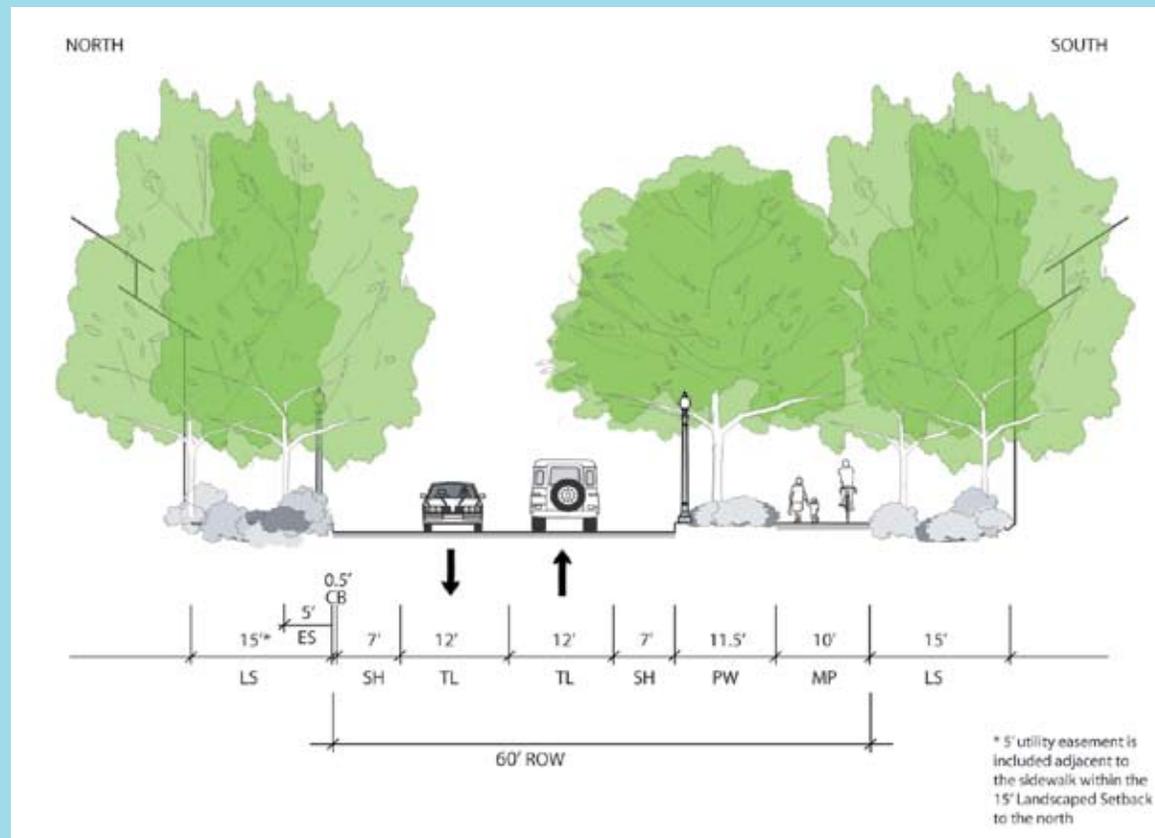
RIVER STREET FROM D STREET TO WATER RECYCLING PLANT
